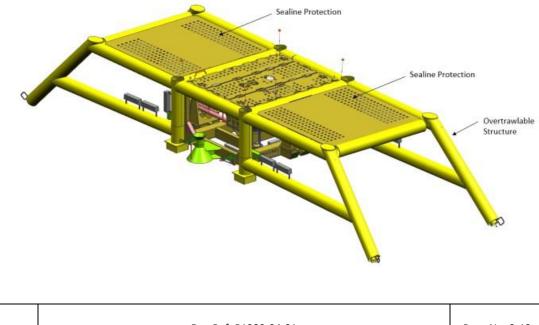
HTT2 Tie-In Layout and Protection Structure
